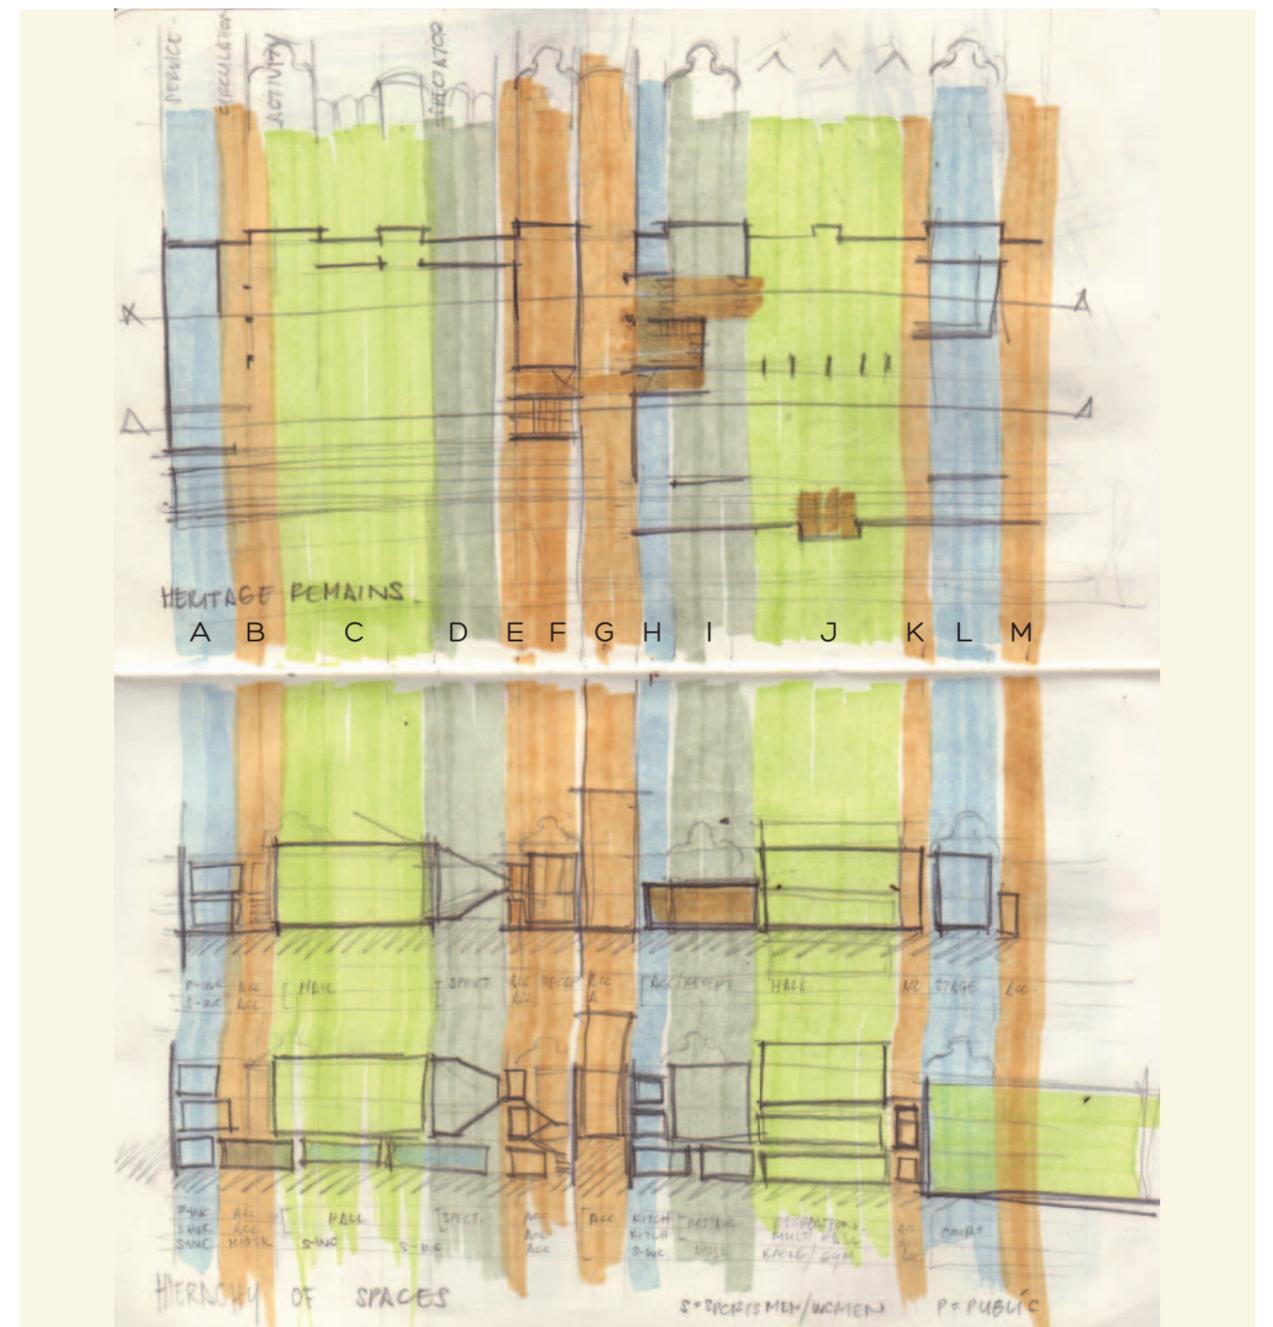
Diagram of zones on plan and north-south sections (Author July 2013)
